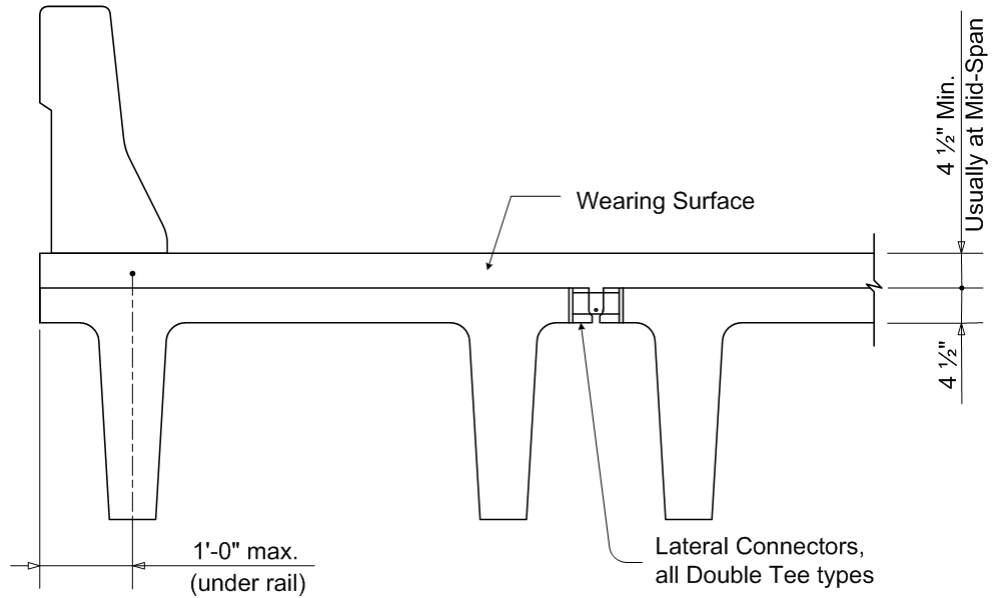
Prestressed Double Tee Beam Typical Section
